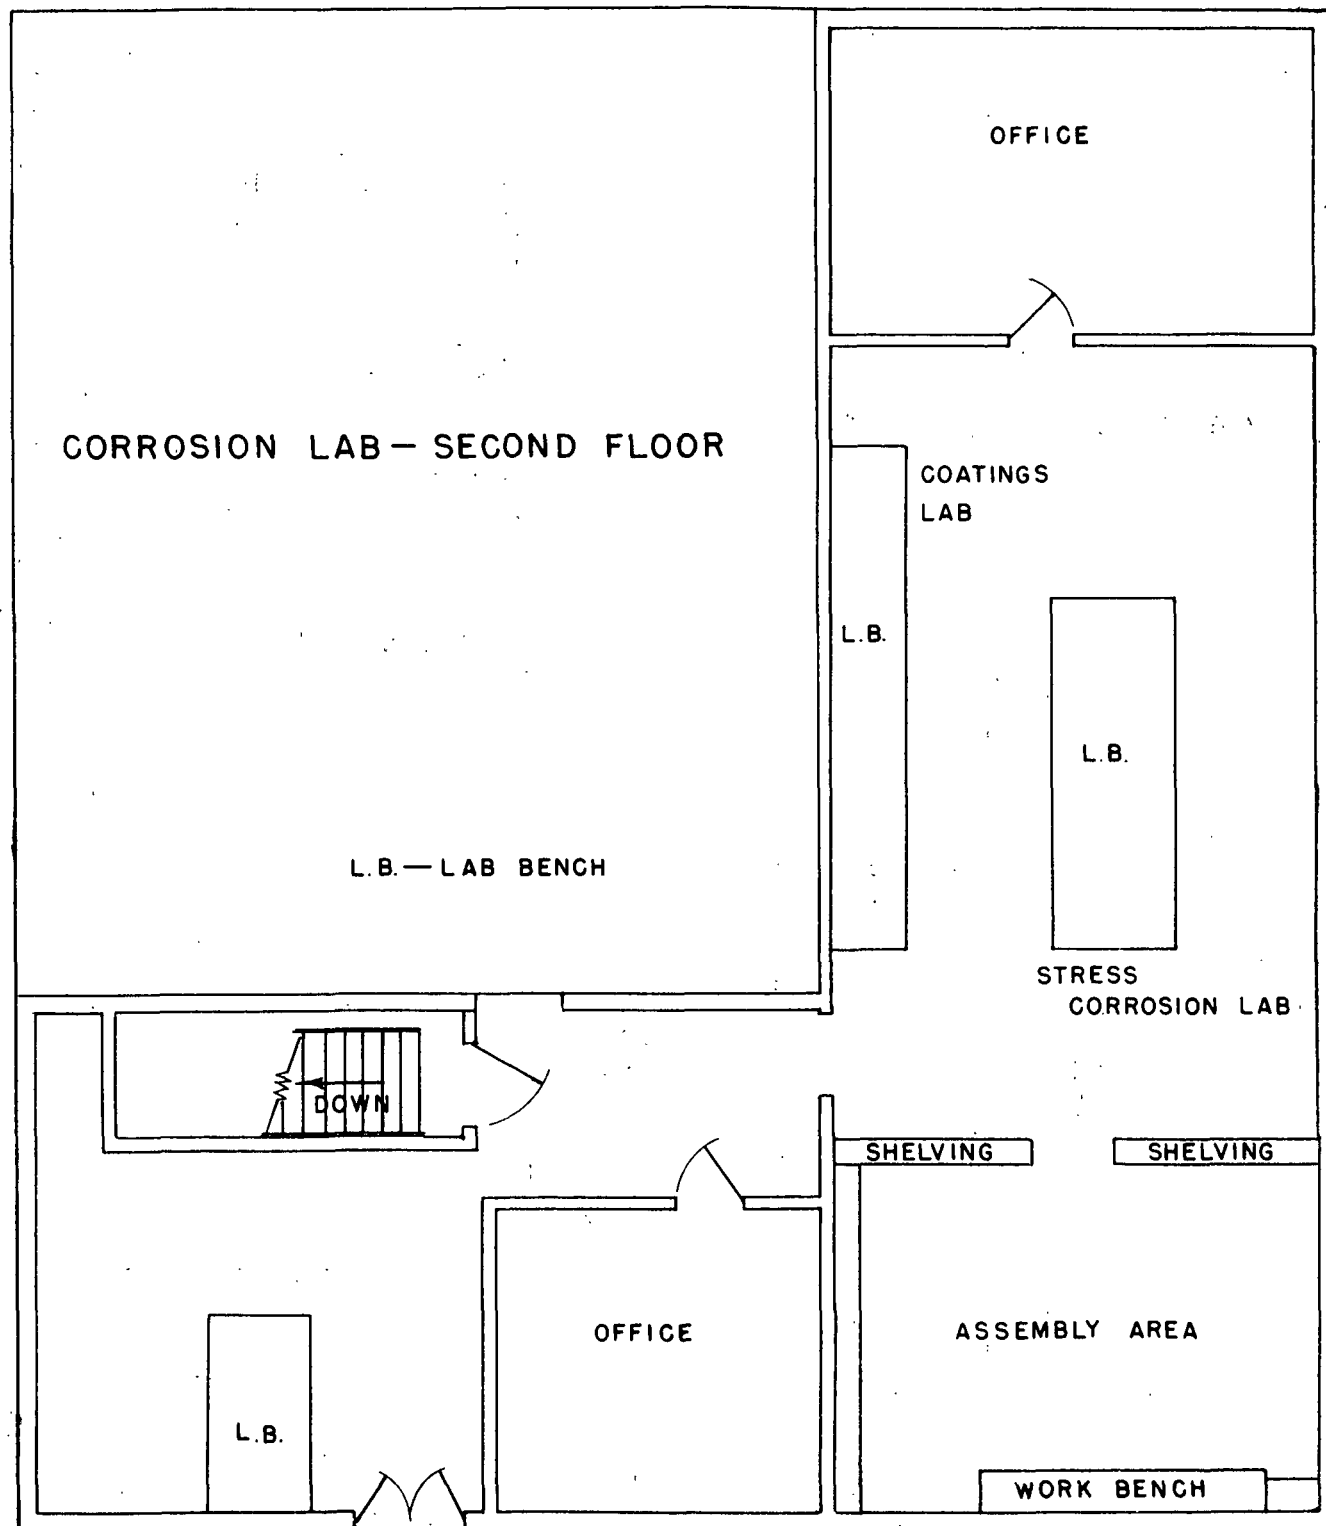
Layout of second floor, plan of Annex Building showing locations for erosion corrosion, stress corrosion, and coatings/nonmetallics labs.
